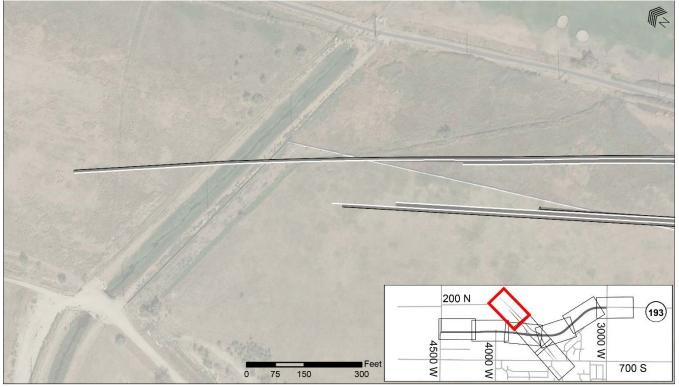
Preferred Alternative Detail Plan View (8 of 9)
